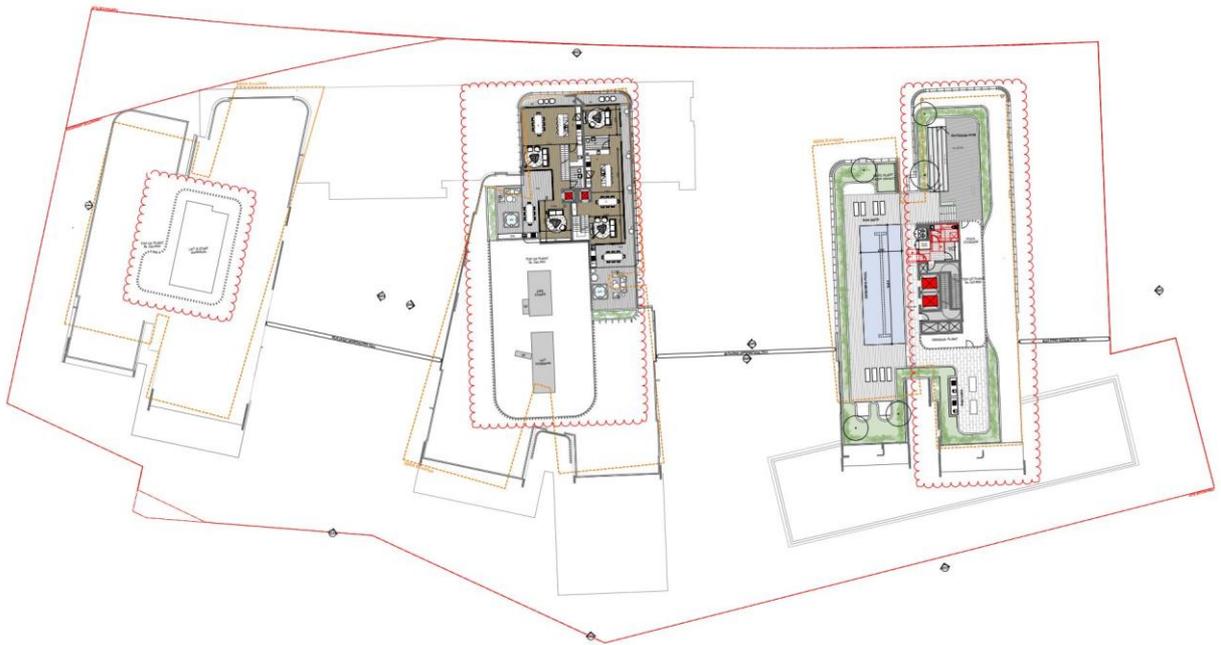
| Level 13 floor plan (Source: Applicant's RTS)
